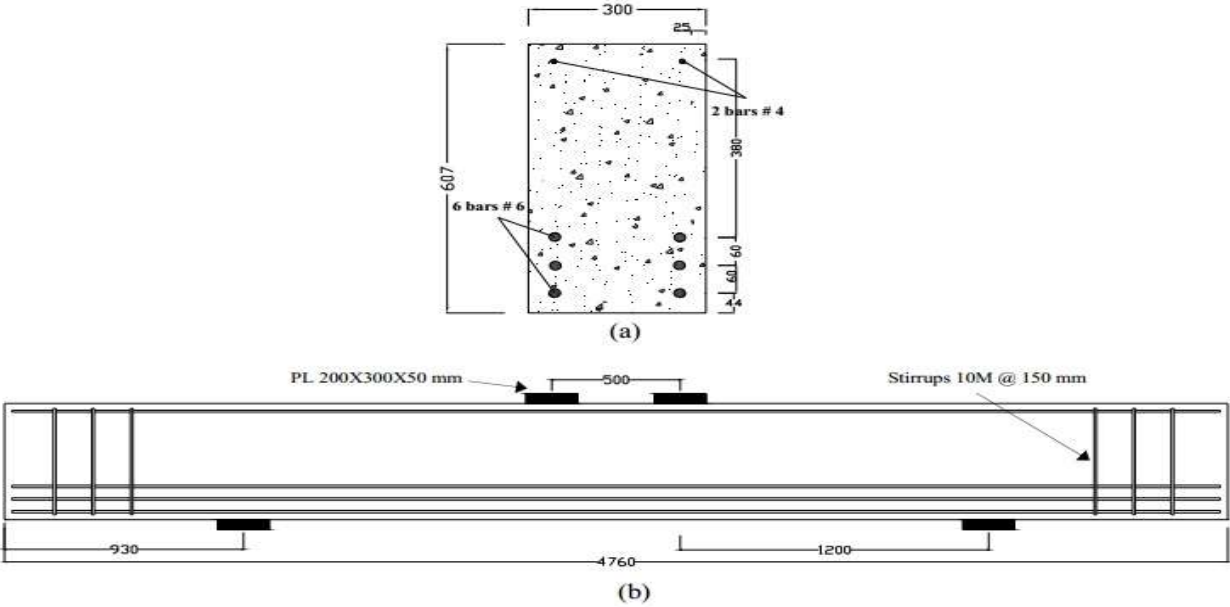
6: Beam MW3-2(a) Cross Section (b) Elevation
